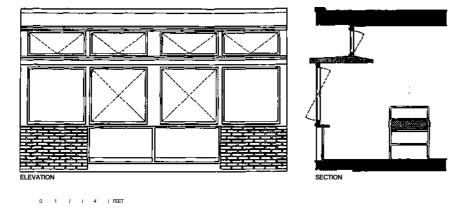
Elevation and section of the windows in the experimental wards at Larkjield Hospital
